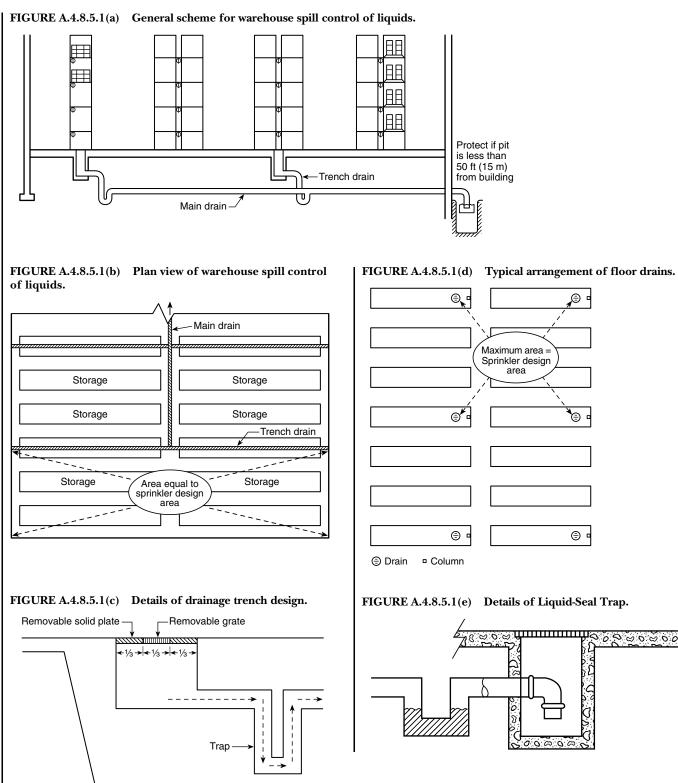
(d) Typical arrangement of floor drains.
